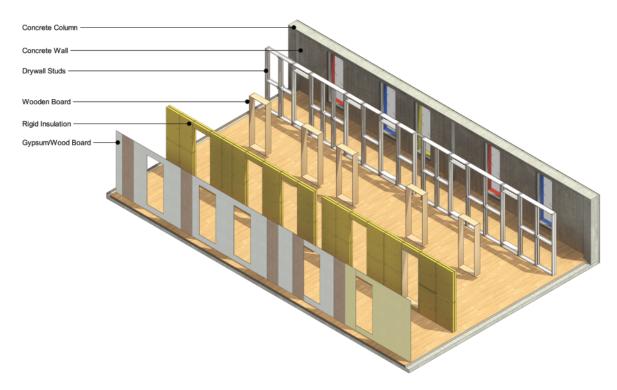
Selected classroom Drywall Detail, Elaborated by authors
